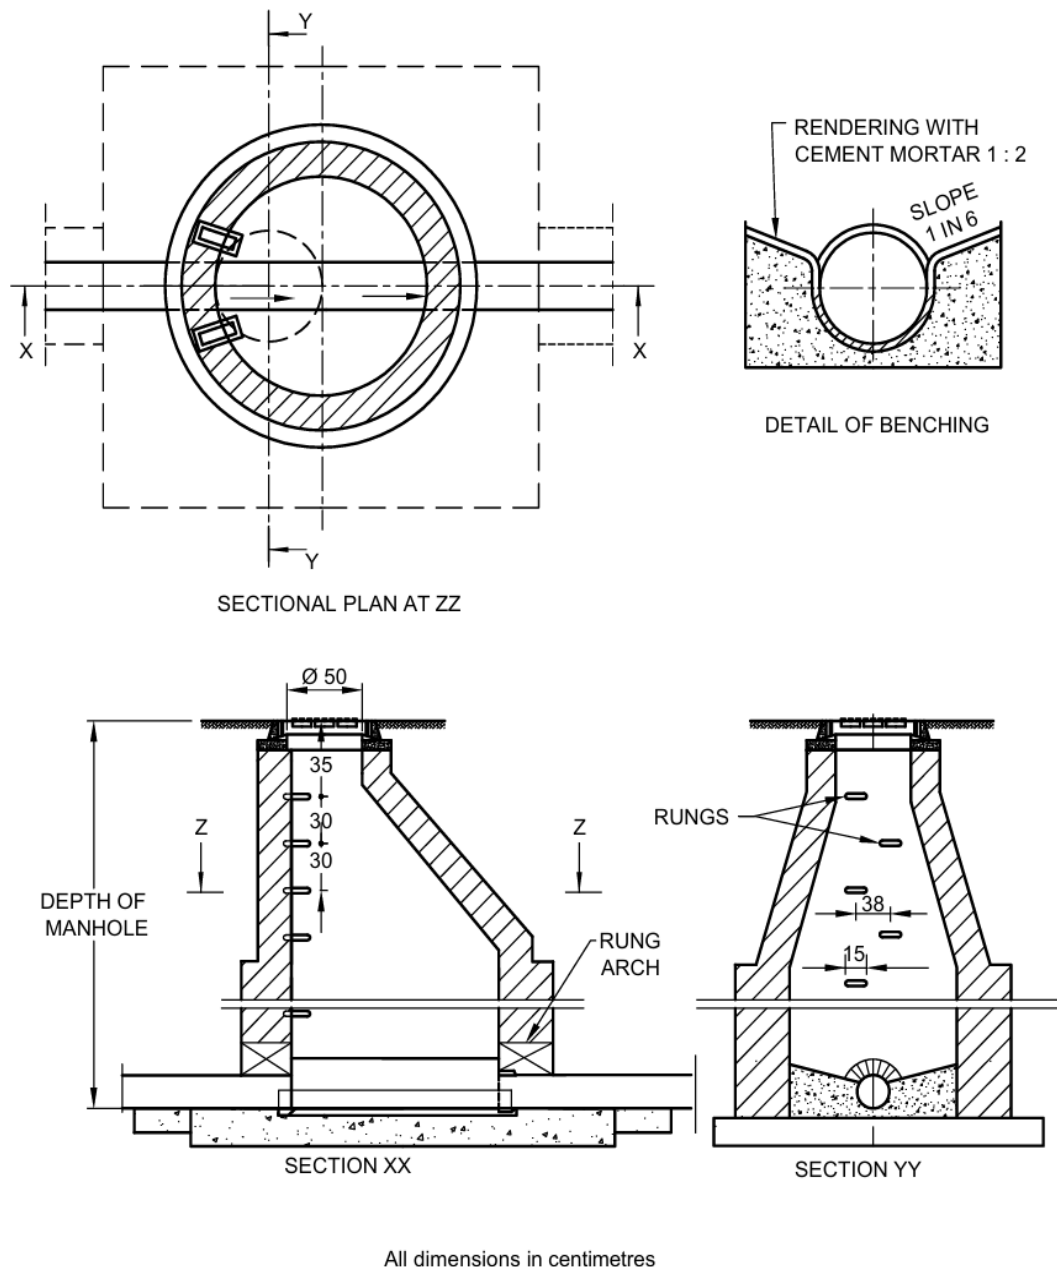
DETAIL OF MANHOLE (DEPTH 2.5 m AND ABOVE)
